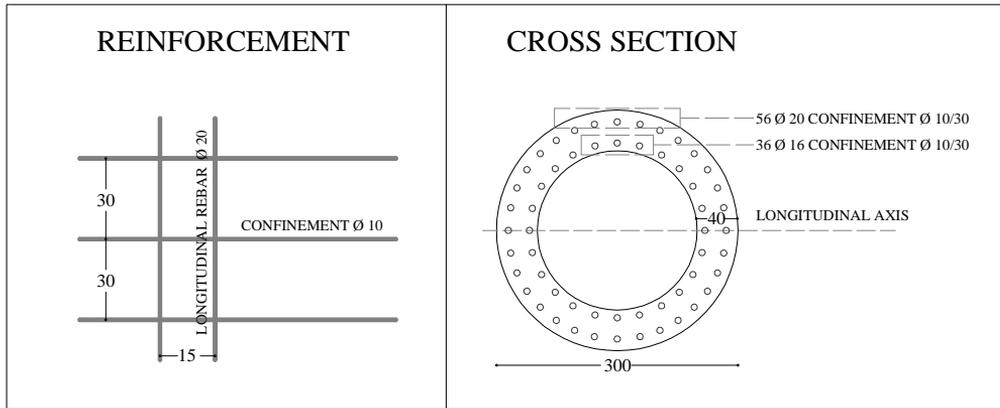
Cross section and structural detail for in river bed piers. Dimensions are in centimeter and millimeter
